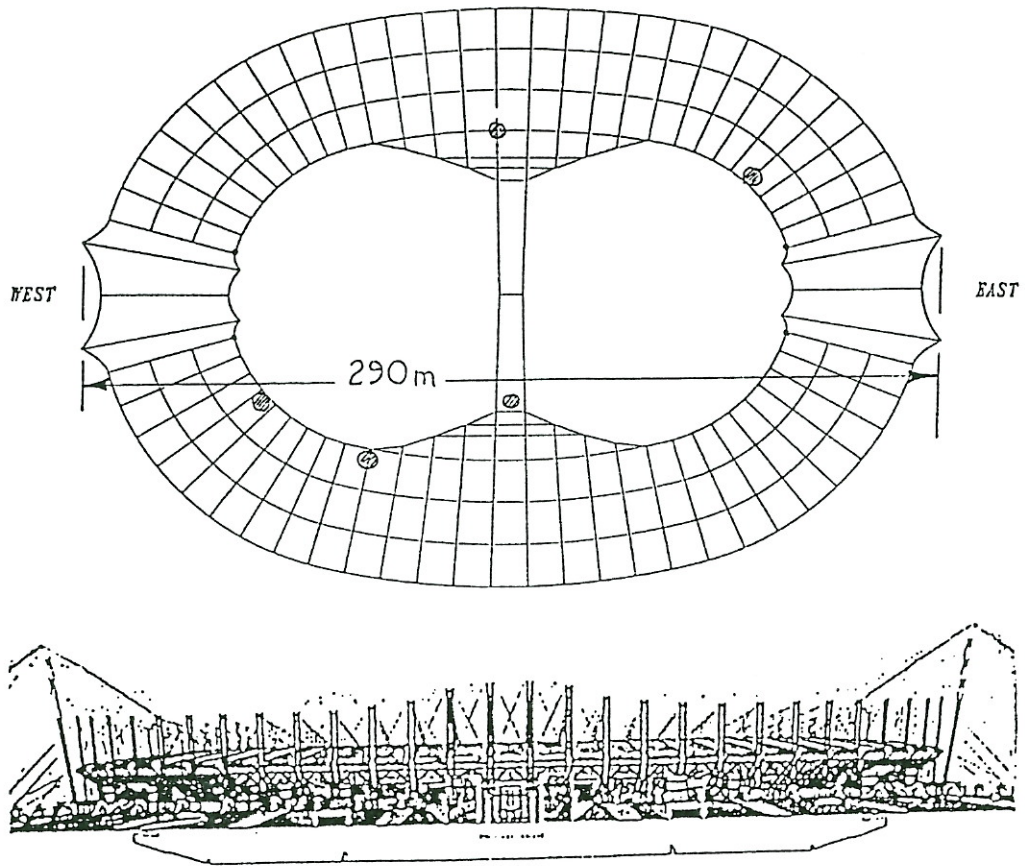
Roof Plan and Stadium Elevation of the "Stadio delle Alpi" , Turin
